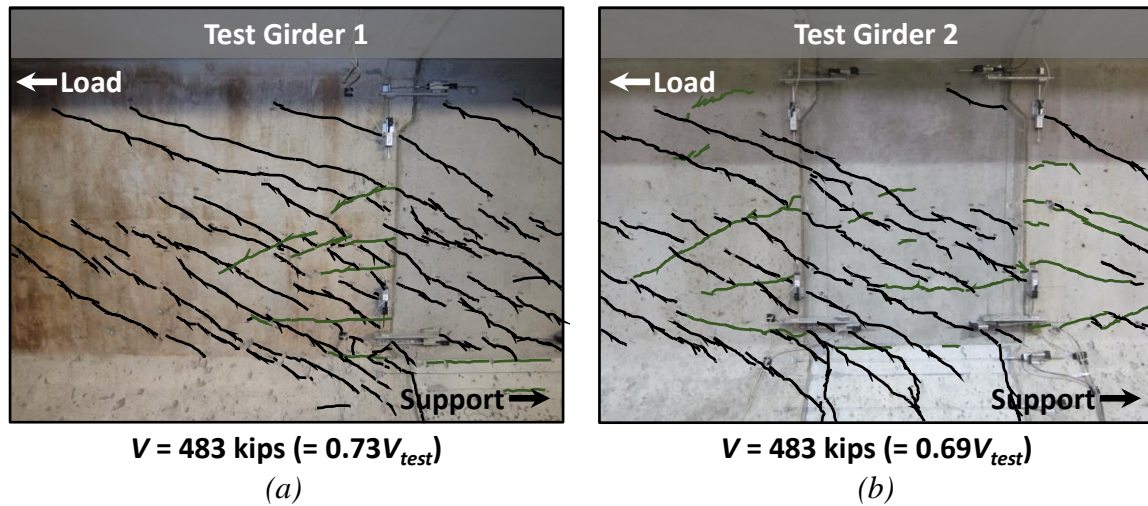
Cracks extending through the web – (a) Test Girder 1; (b) Test Girder 2
